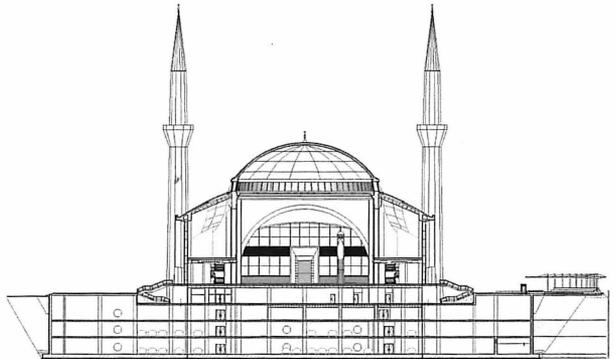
Section AA of AHA Mosque, facing toward the *qibla* wall.
